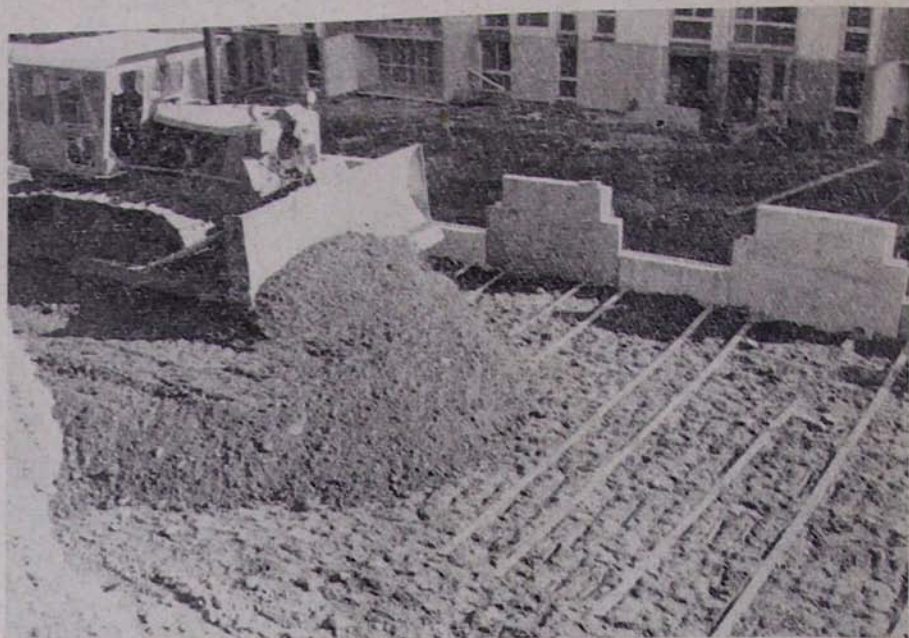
Construction of a Reinforced Earth fill. Precast skin, concrete scales, reinforcing strips secured to scales. Fill placement under way. Note that bulldozer is working at the edge of the fill.
